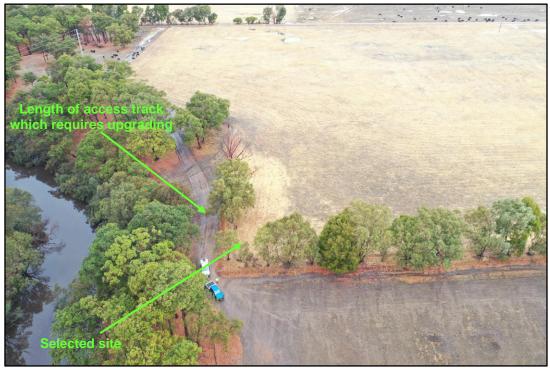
Existing access route to the selected site, showing section requiring upgrading (Ventia)
